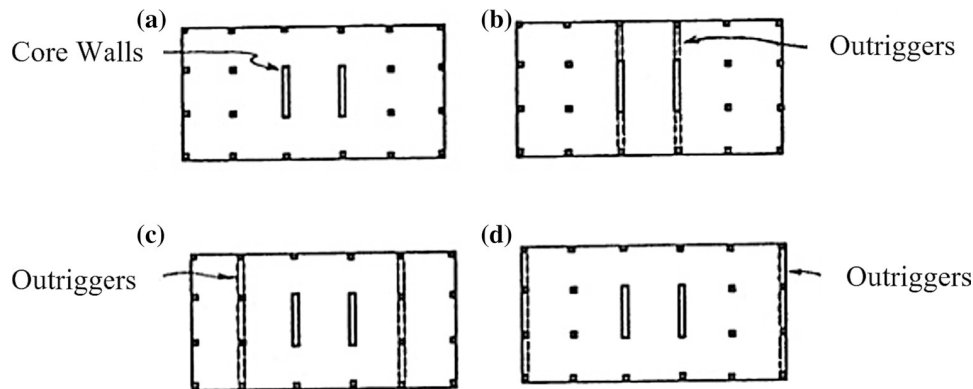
Different Forms of Outrigger structural systems a) Base Model (Core Only) b) Conventional Outrigger System c) Offset outrigger system d) alternate offset outrigger system
